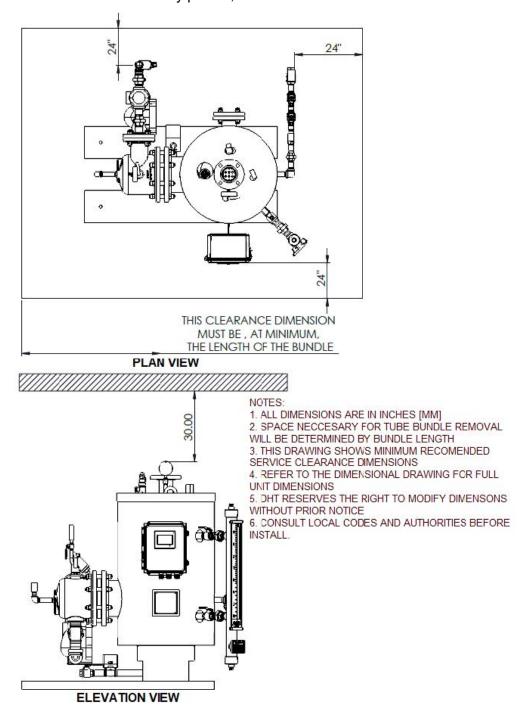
SS SERIES VERTICAL UNIT INSTALLATION CLEARANCE DRAWING
